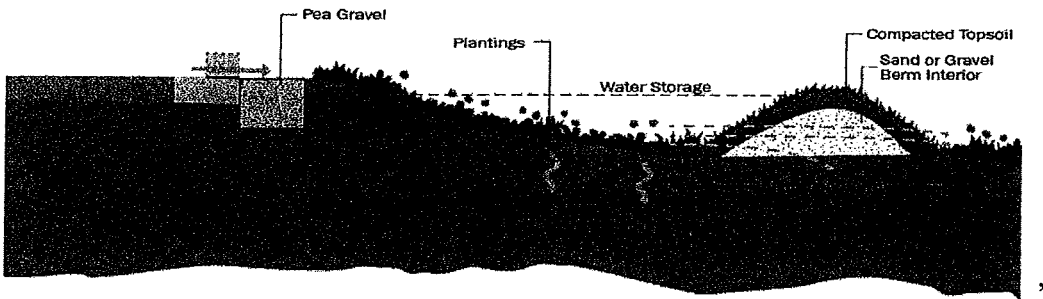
Typical Installation – Slope ≥ 5% but ≤ 10%
